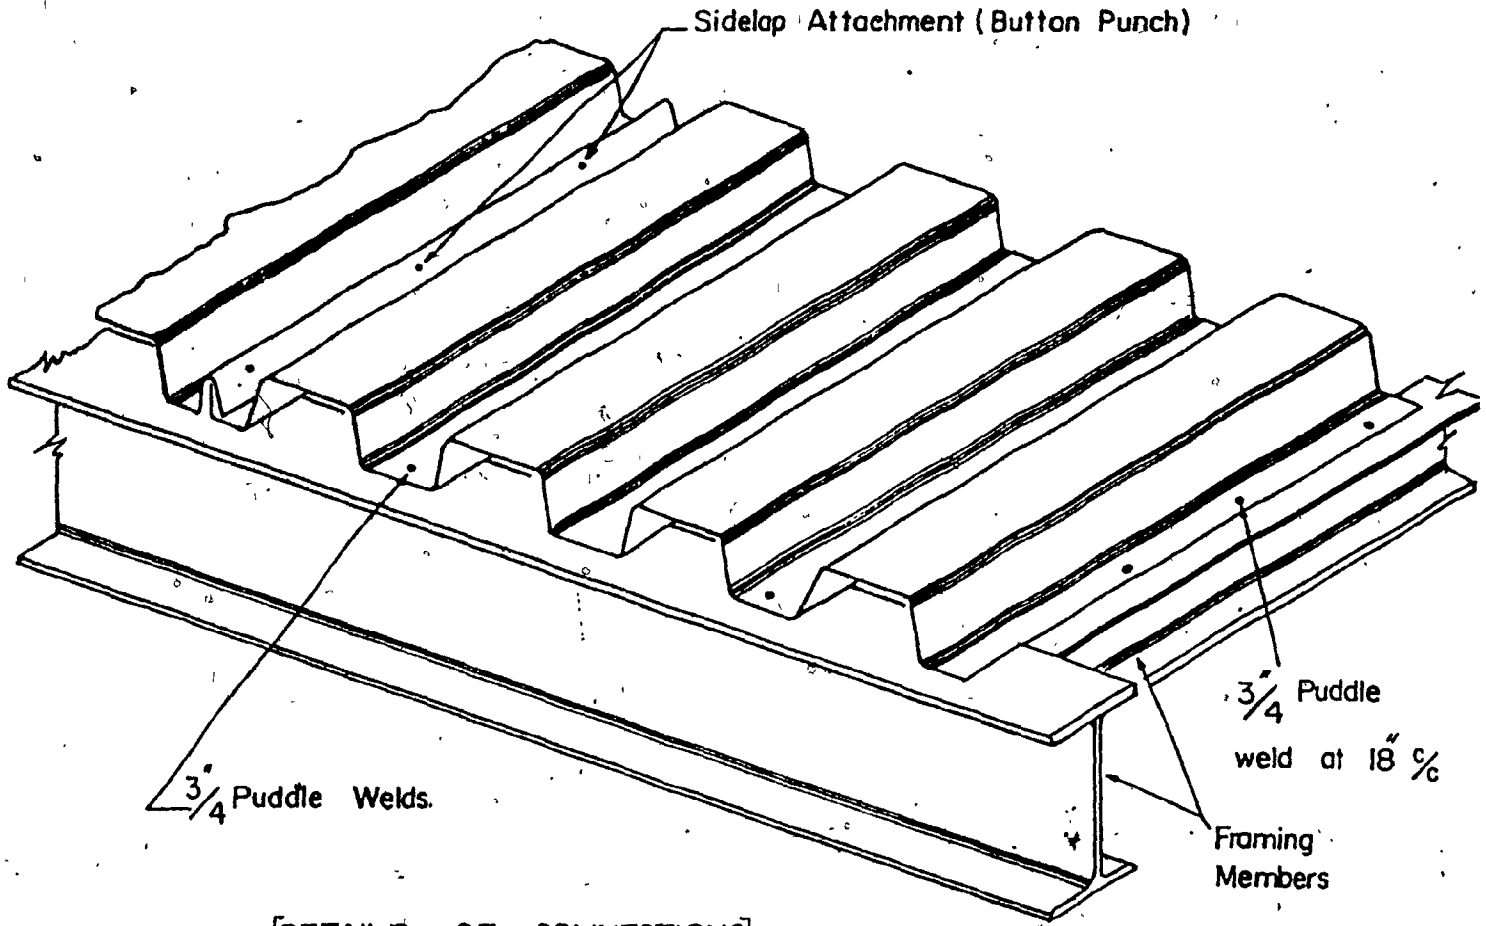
a [DETAILS OF CONNECTIONS]
